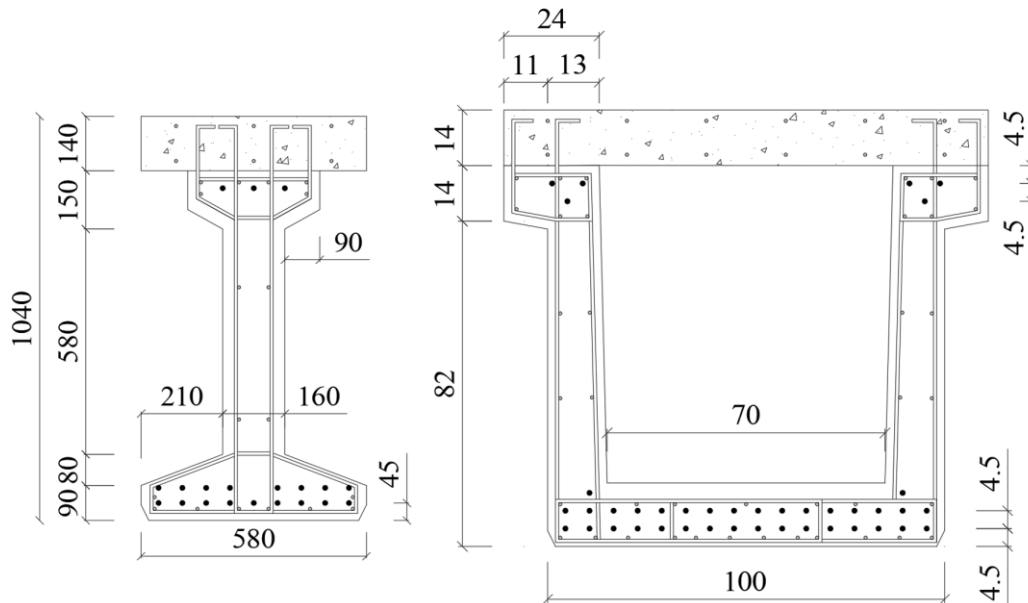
Layout of reinforcement in I-shaped and box cross-section.
